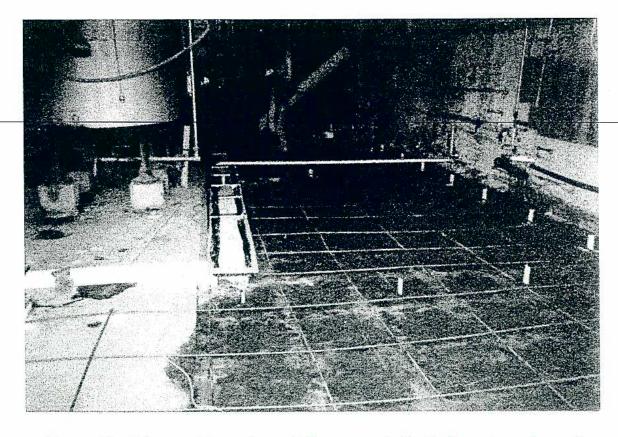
View to East of partially cemented pit, floor trench, and reinforcing rod for new floor.
